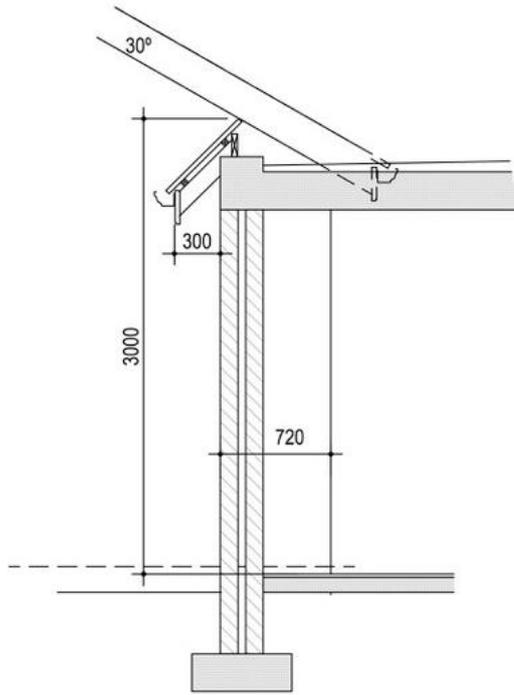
Typical alignment of a fringe and a barge board at the junction where a flat roof area overlaps the gable or wall of a main pitched roof building. (Refer to Figure 13).
